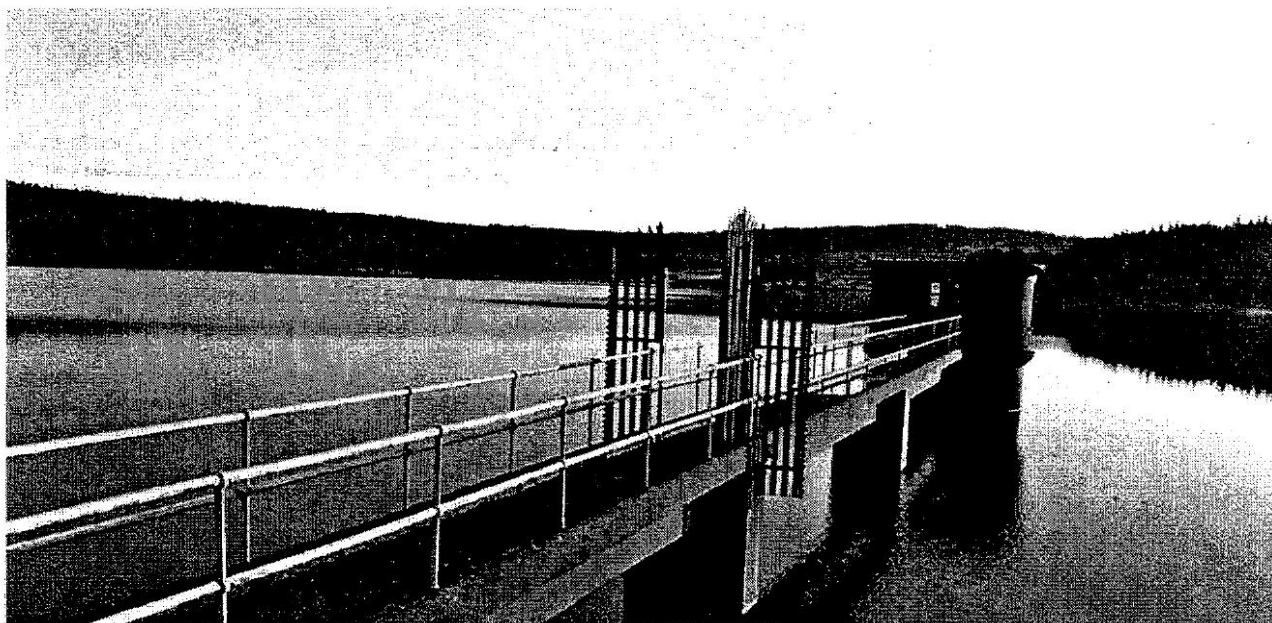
Killylane, Carrickfergus– concrete valve tower superstructure
